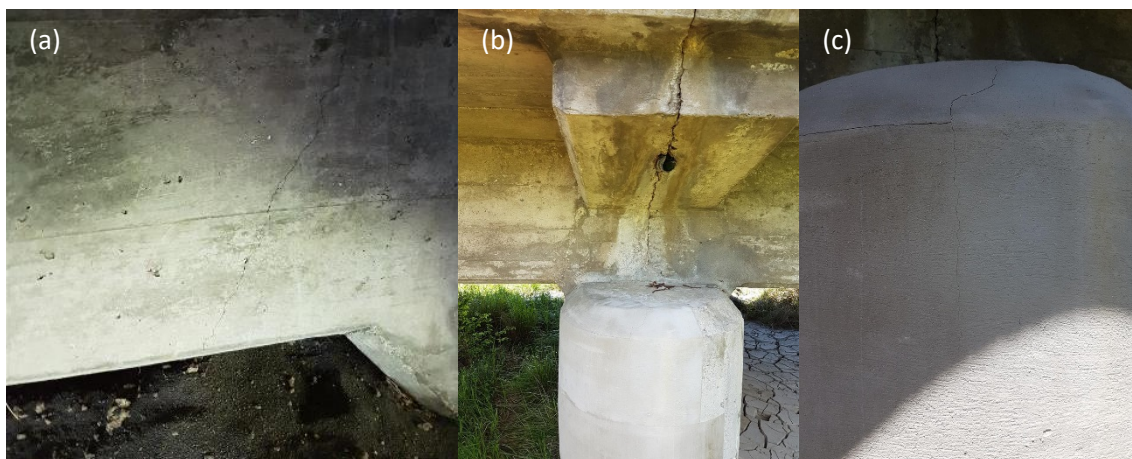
a) Minor cracking of capping beam at southern abutment, b) opening of pre-existing horizontal cracks of construction joints at the beam soffits at southern pier c) cracked concrete repairs at the top of pier (photos courtesy of NCTIR)
